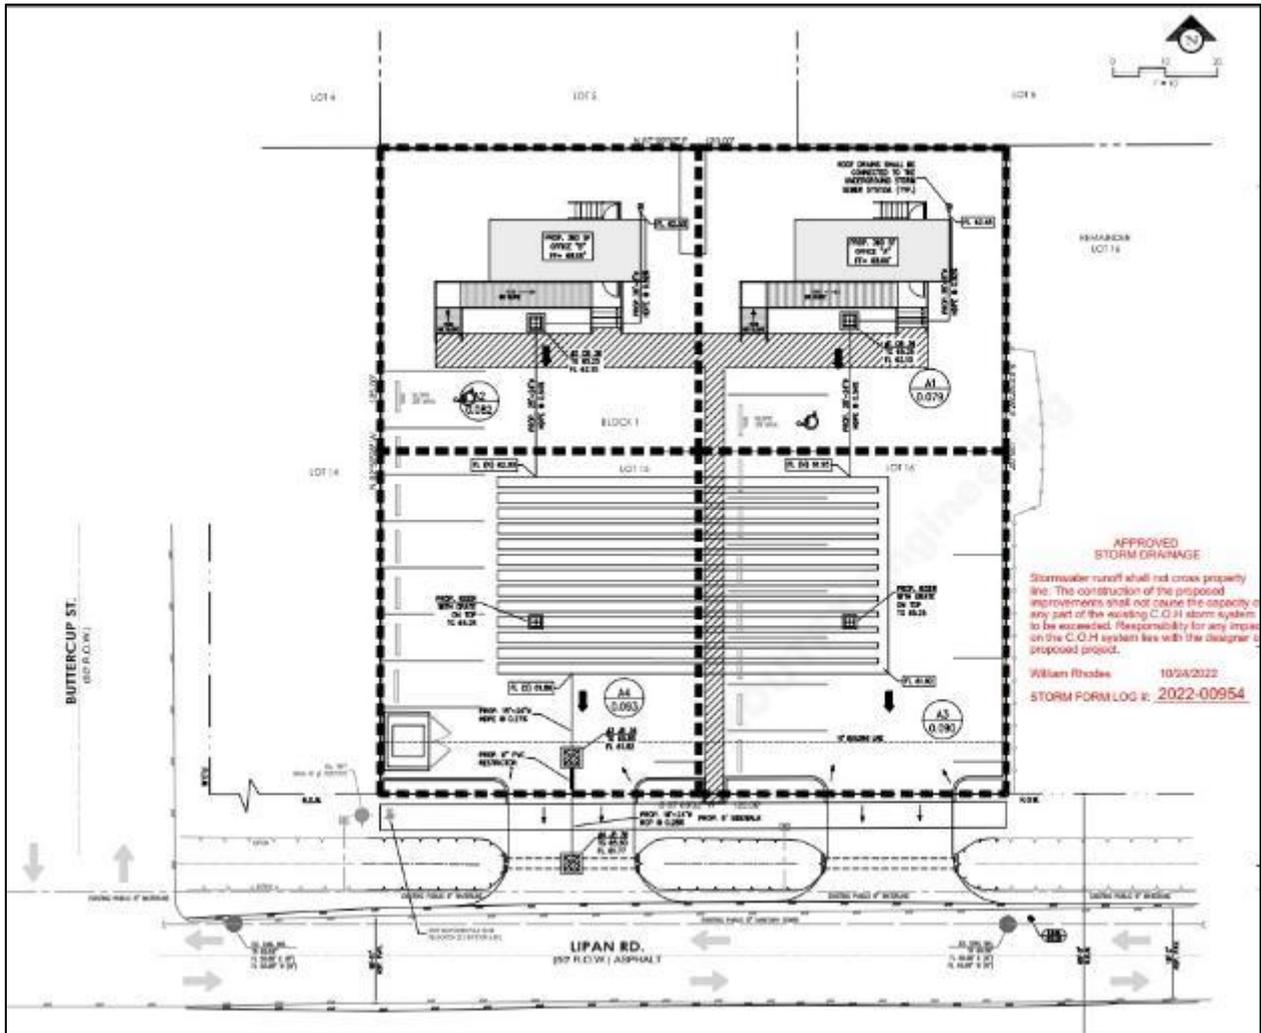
Approved 2022 Houston site plan illustrating the grading layout and underground detention system
